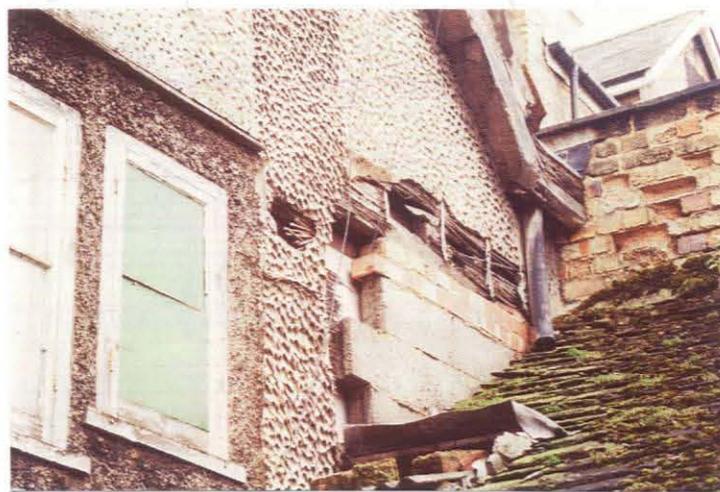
West (rear) gable end of the southernmost range (no.64), looking southeast; showing area of disturbance and repair work in building fabric. Note the exposed timber work and reeded infill panels above the brick and breeze block insertions.
